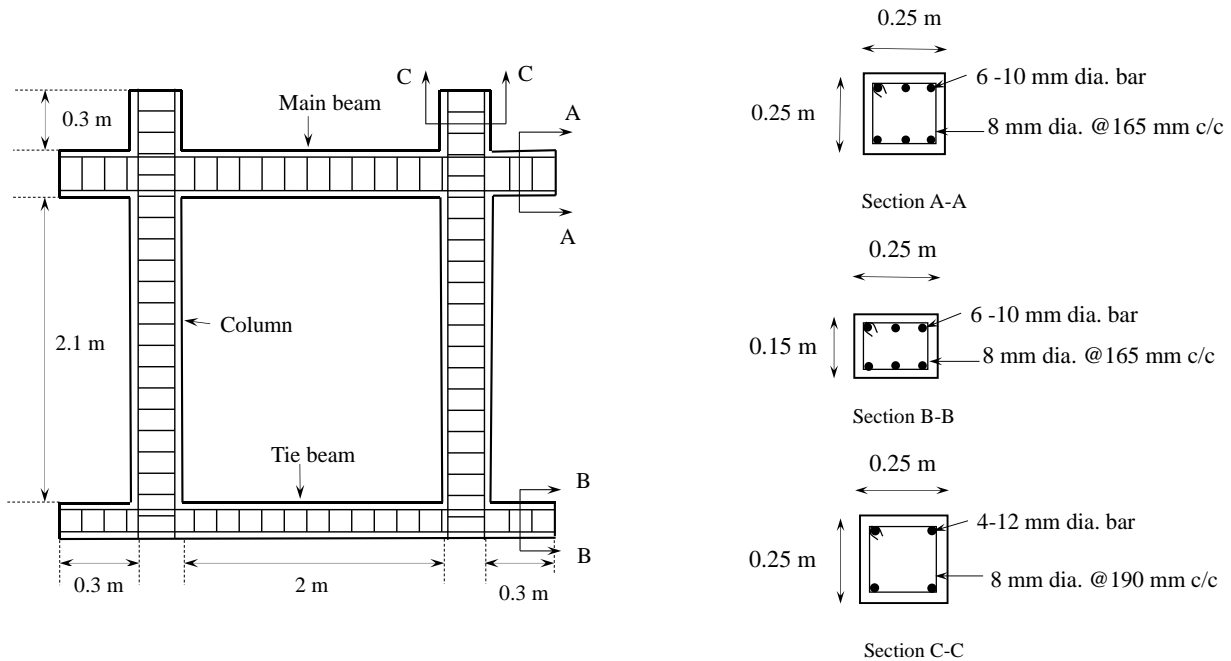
Reinforcement details and frame dimensions of the RC frame
